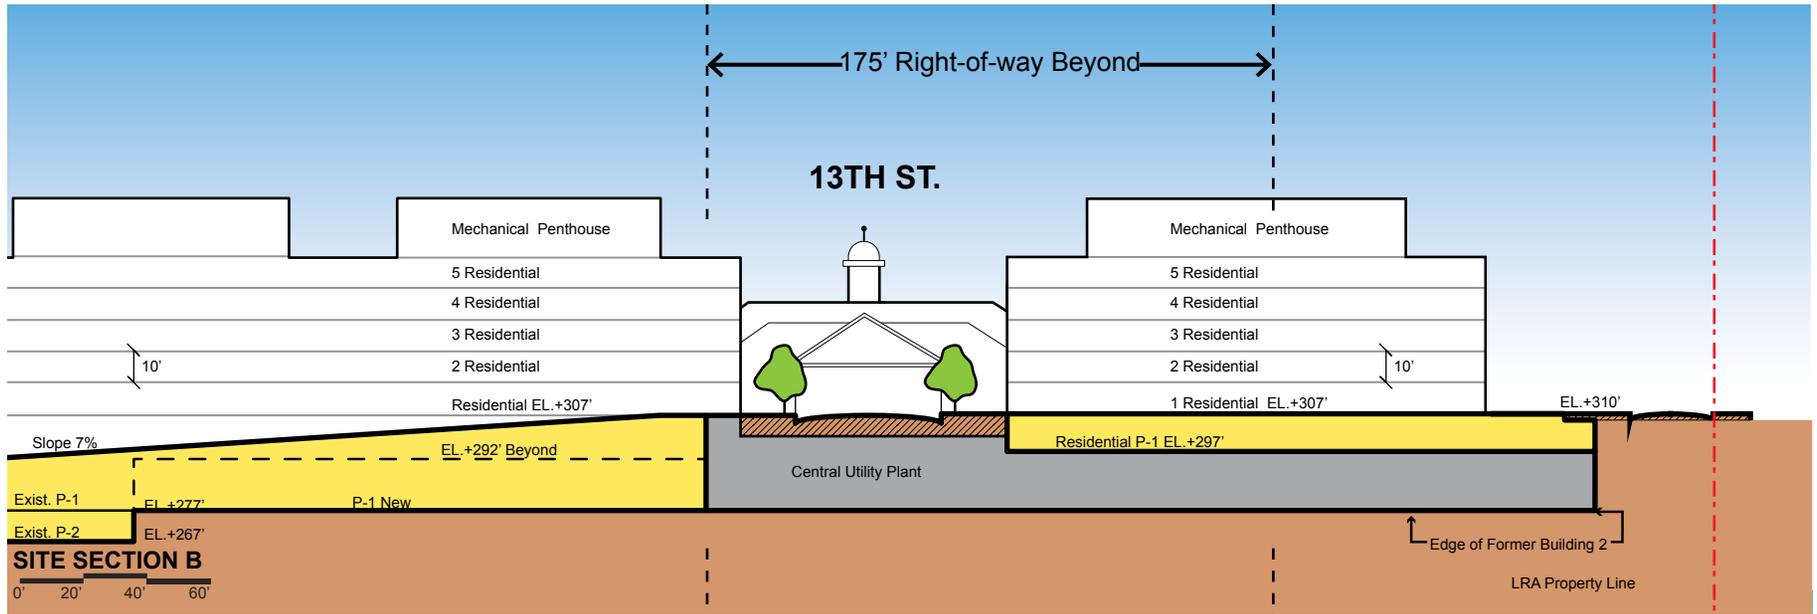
Town Center Site Section. Source: Perkins+Will.
